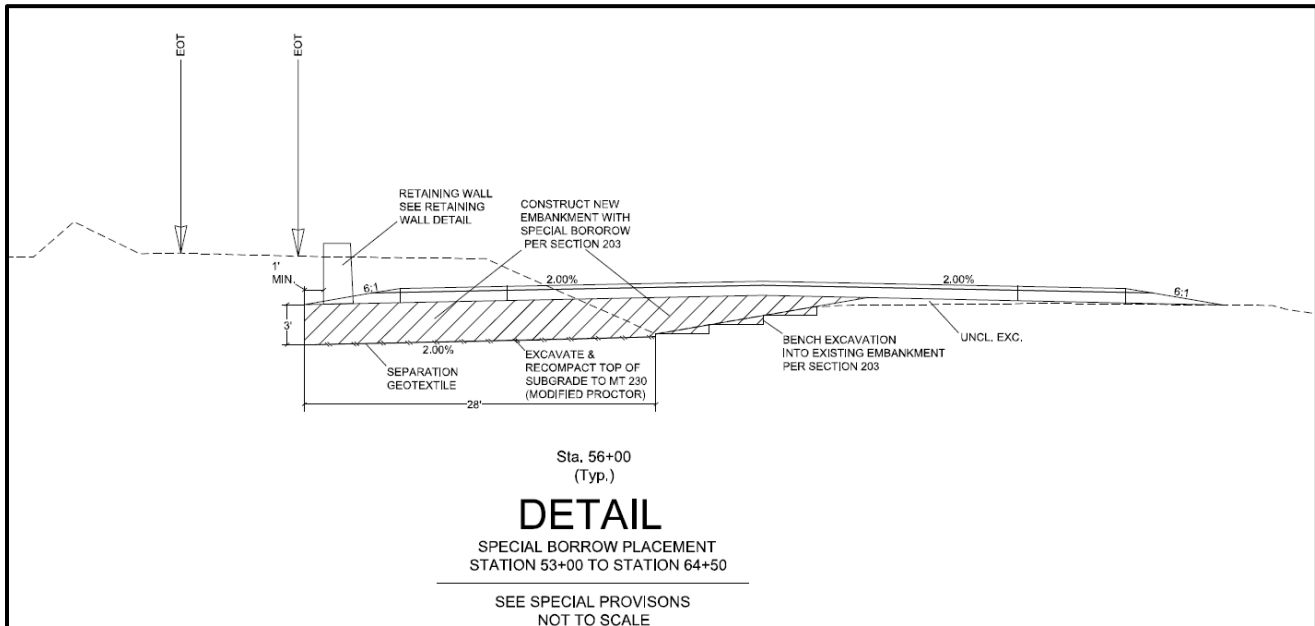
Special Borrow Placement for Liquefaction. Station 53+00 to Station 64+50.
